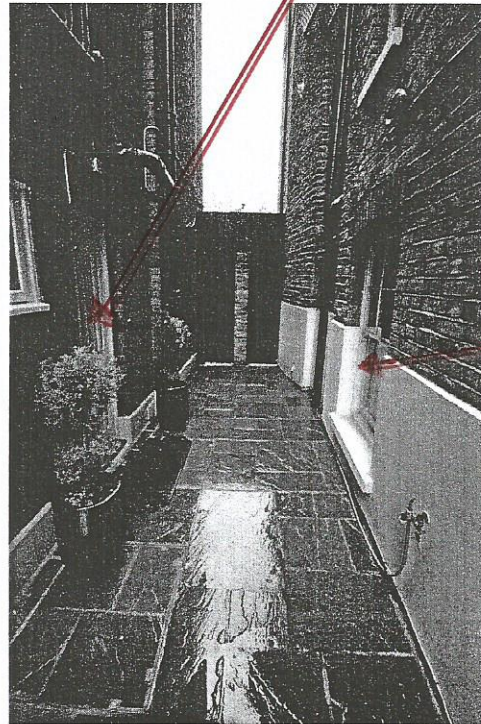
Proposed location of new side entrance (see ground floor window on right of picture).
